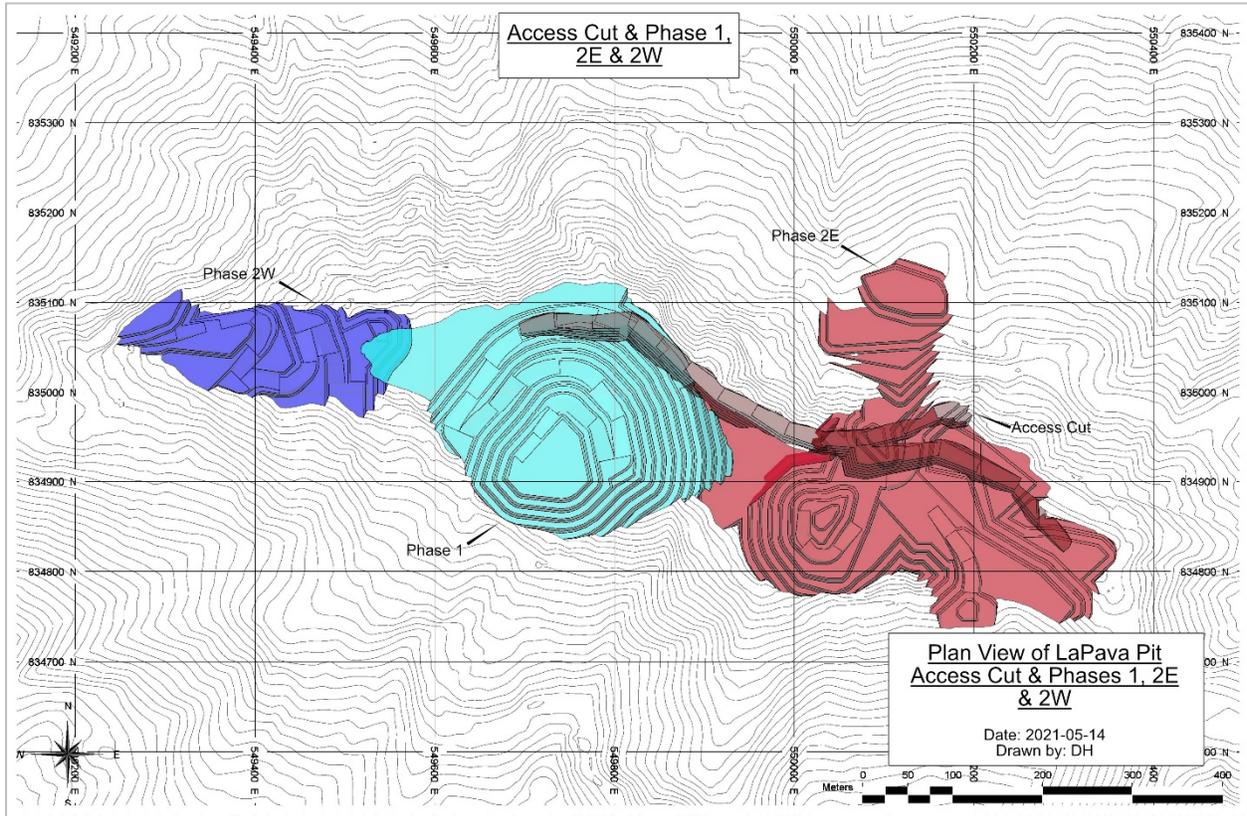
La Pava Addition of Phase 2E and 2W (MMTS, 2021)
